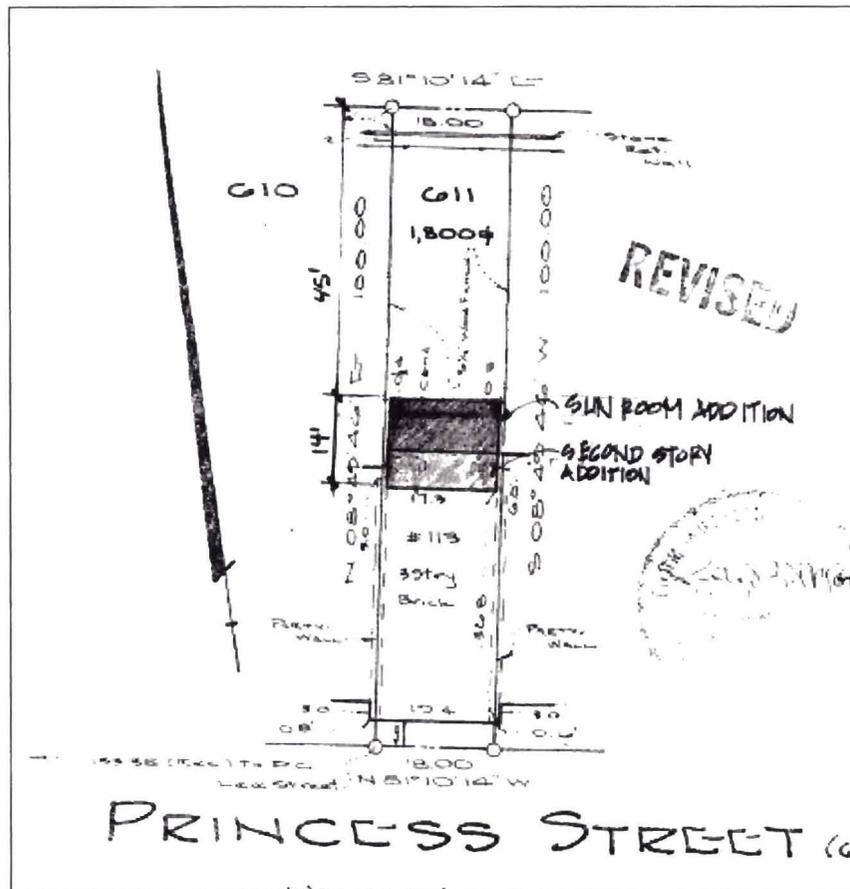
Plat of 113 Princess Street showing location of proposed rear addition.
